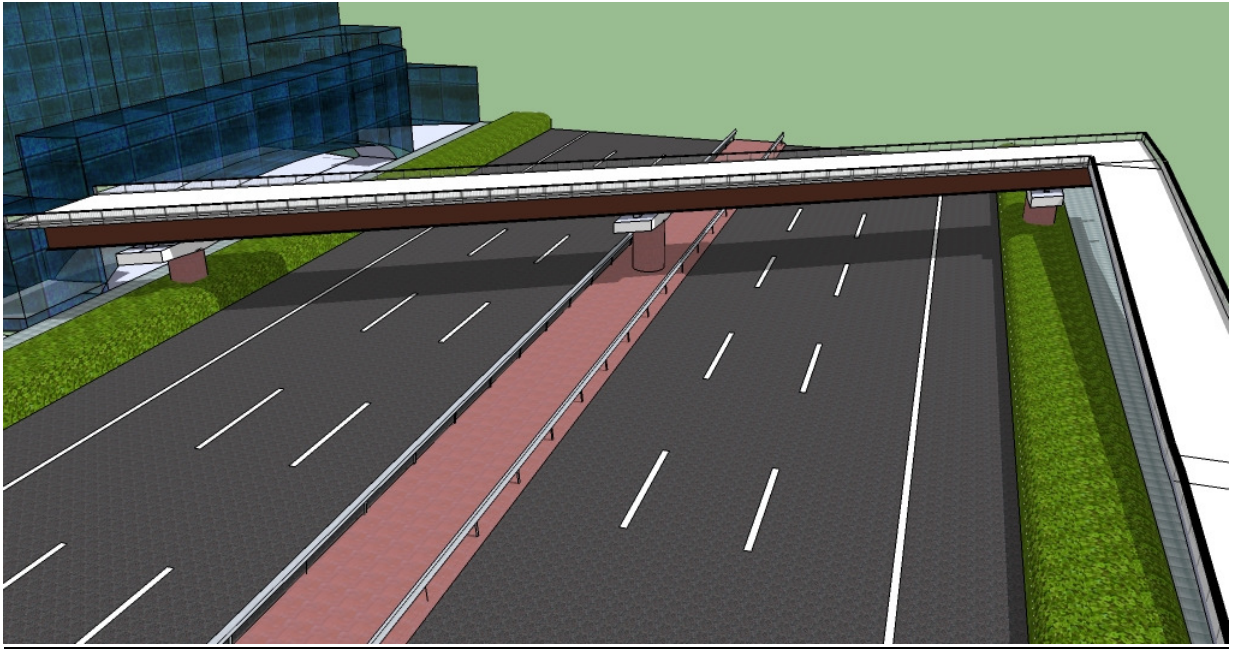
A: Three dimensional view of the bridge and ramp made of RC slab on steel girders
